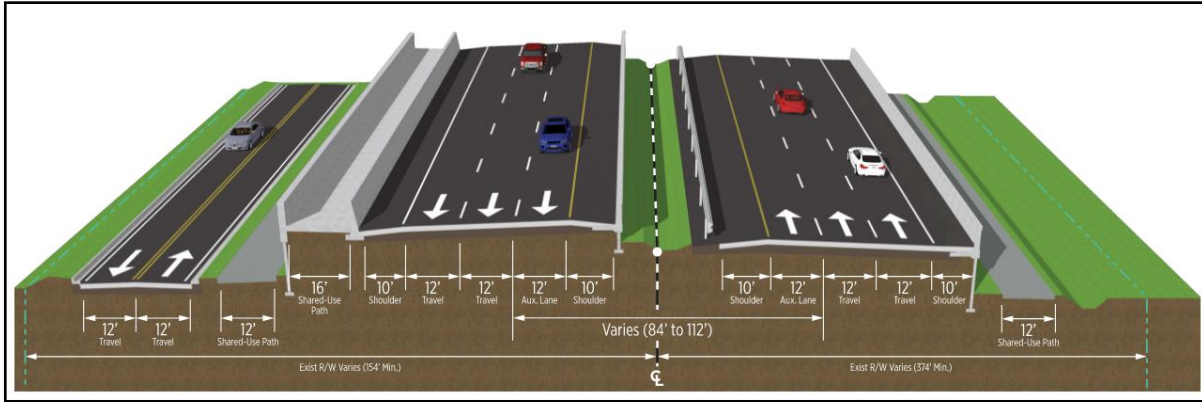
Hillsborough Segment – From east end of Gandy bridges to West Shore Boulevard
